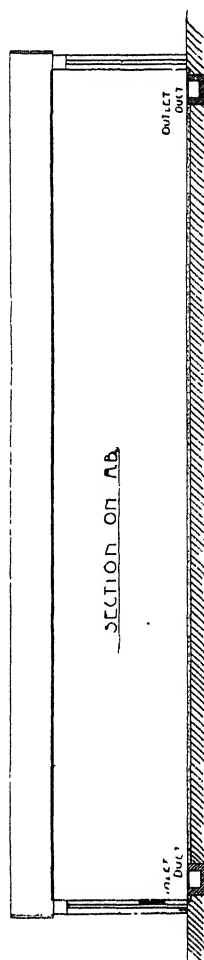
Wells' Timber-drying apparatus with positive circulation. Sectional elevation.
